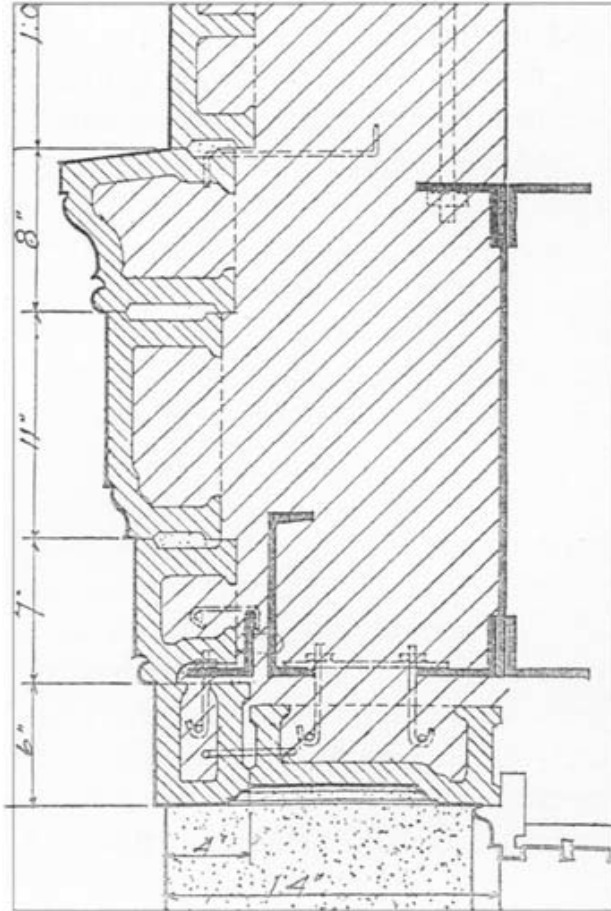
Typical construction detail of architectural terra-cotta ornament, showing anchoring system. Source: National Terra Cotta Society, *Architectural Terra Cotta: Standard Construction*, 1914.
